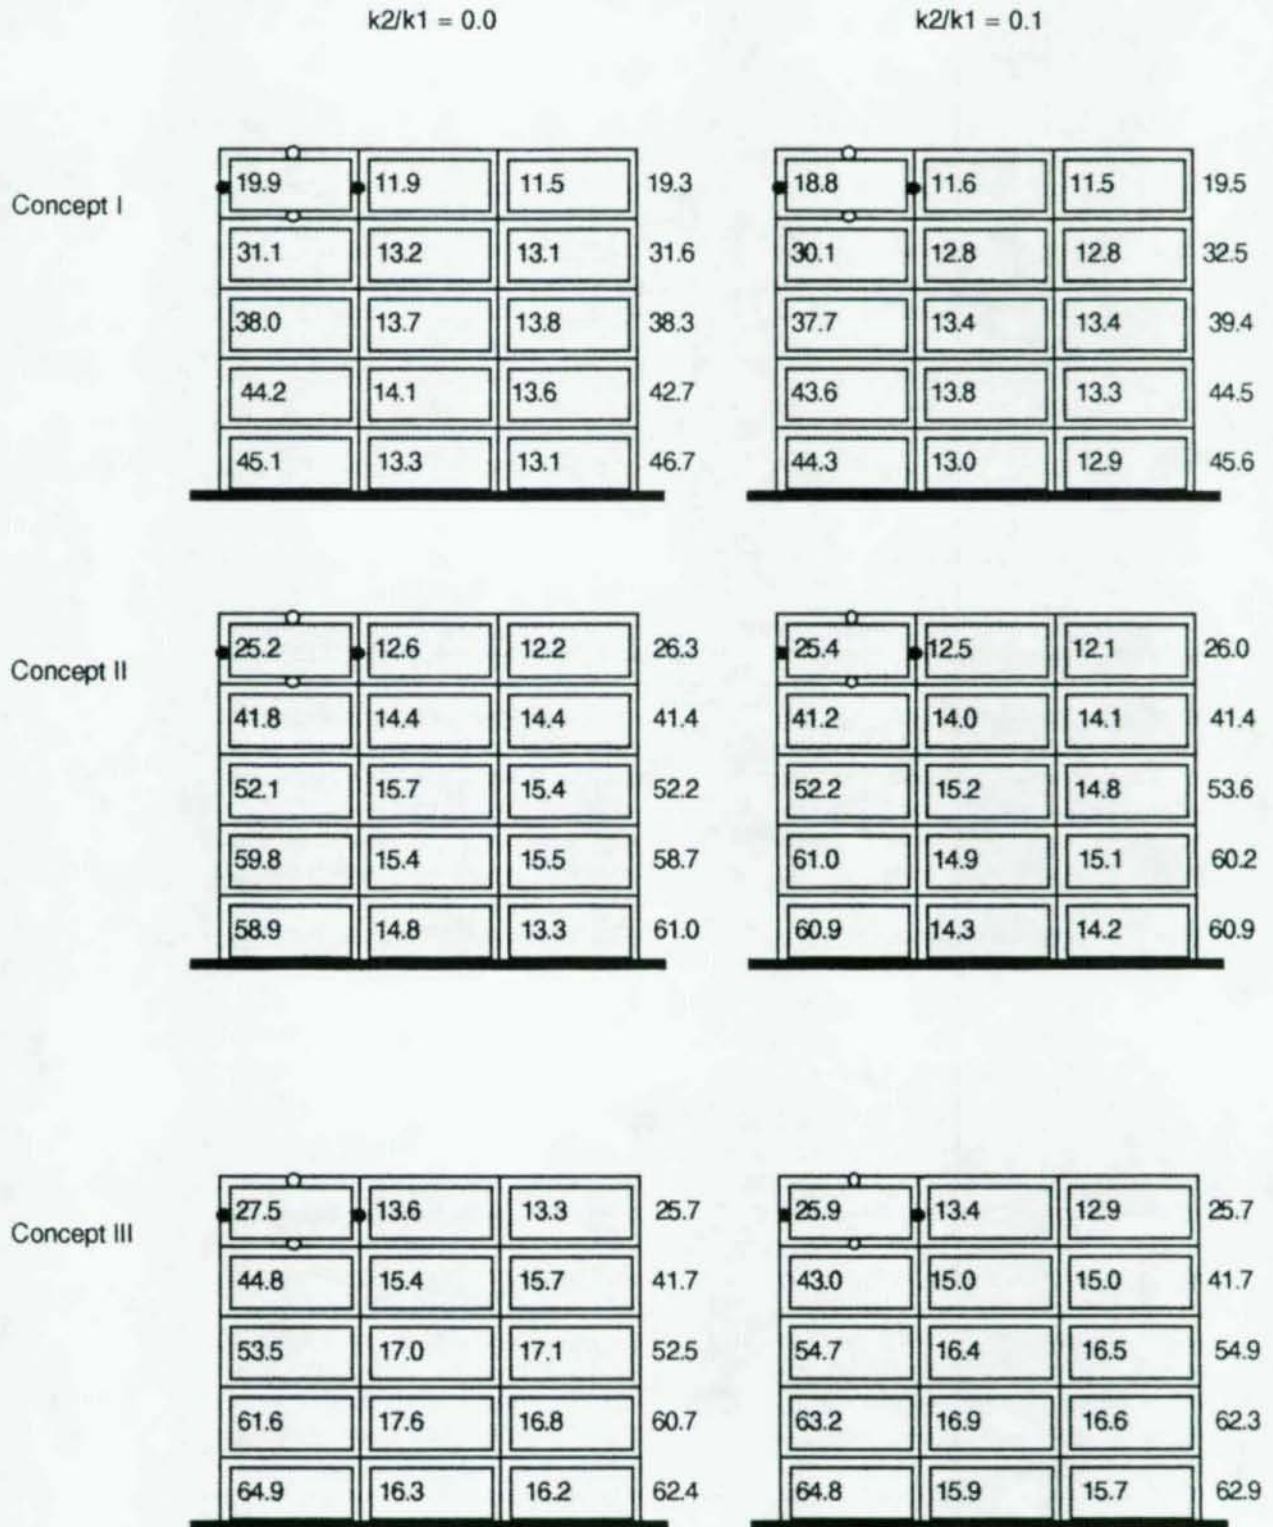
Clad Frame B: Envelopes of Forces (kips) in Side Panel Connections
